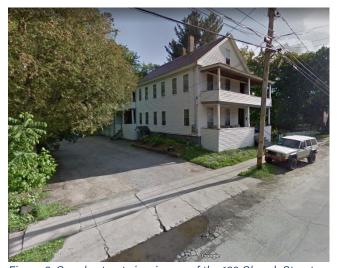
Google street view image of the 169 Church Street property from May 2012, which shows the existing curb cut and City sidewalk on Church Street.
